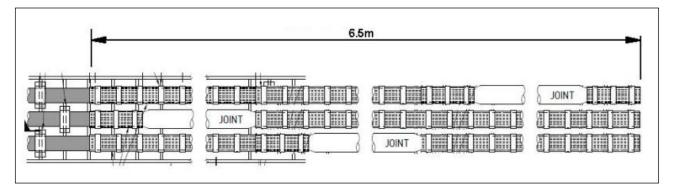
Example of fire blankets wrapping cables in proximity to joints
